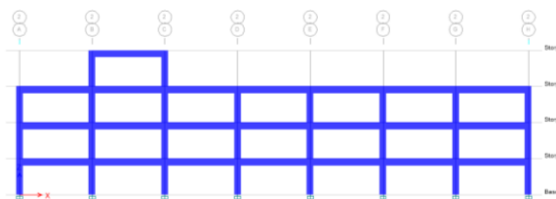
Asymmetric 15 Bedded Hospital Building Elevation at one specific grid
